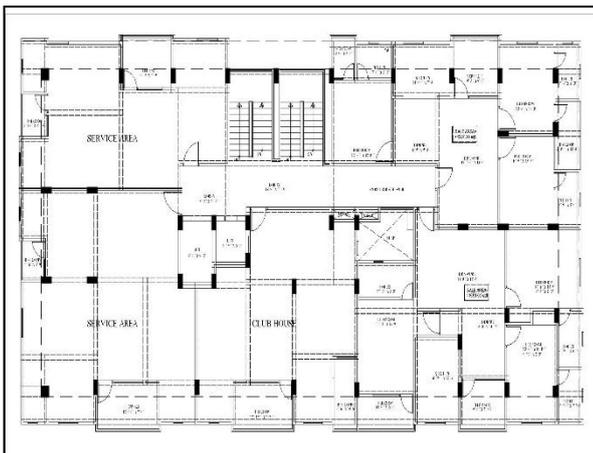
Plan of the building in AutoCAD and ETABS (Version 9.6)
